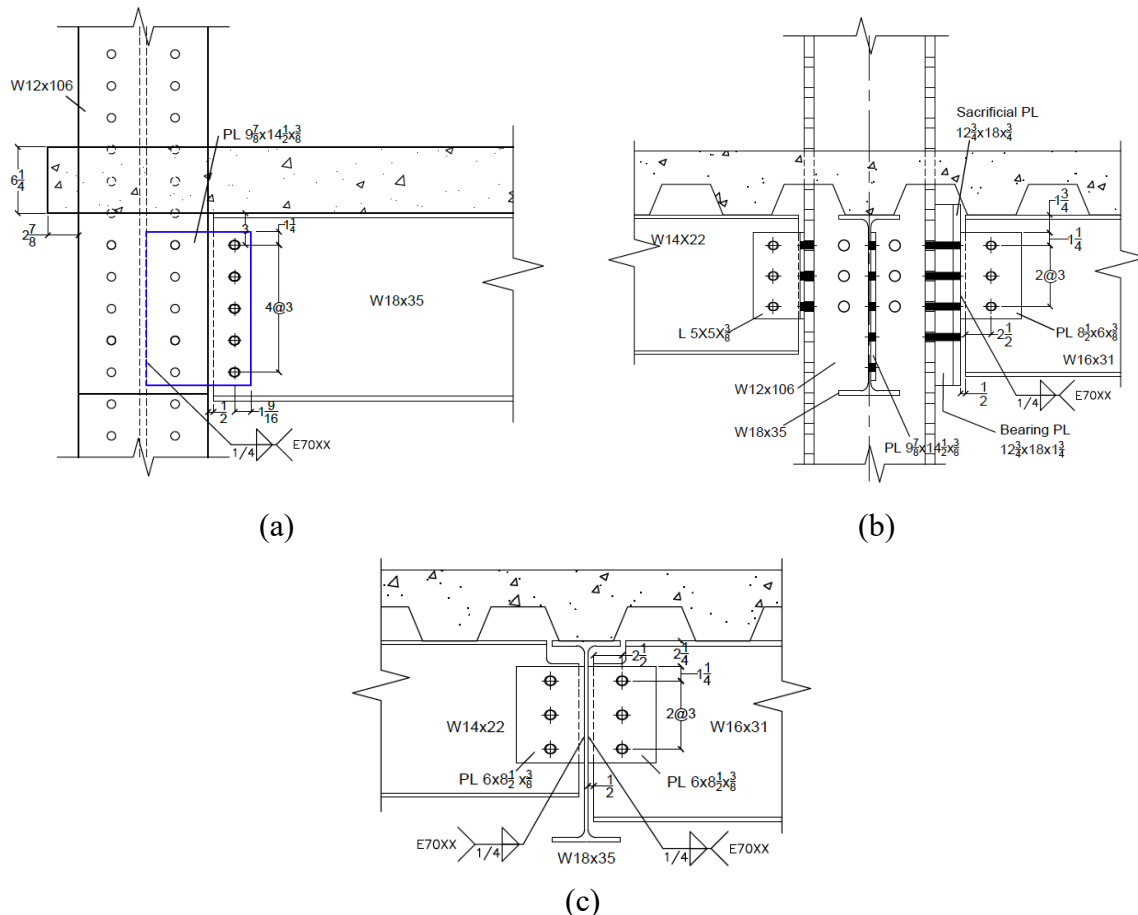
Scale drawings of connection details in the test bay. Units are in inches.
